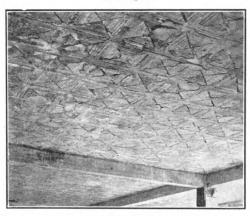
Appearance of Ceiling After Floor Is Laid and "Centering" Removed.
